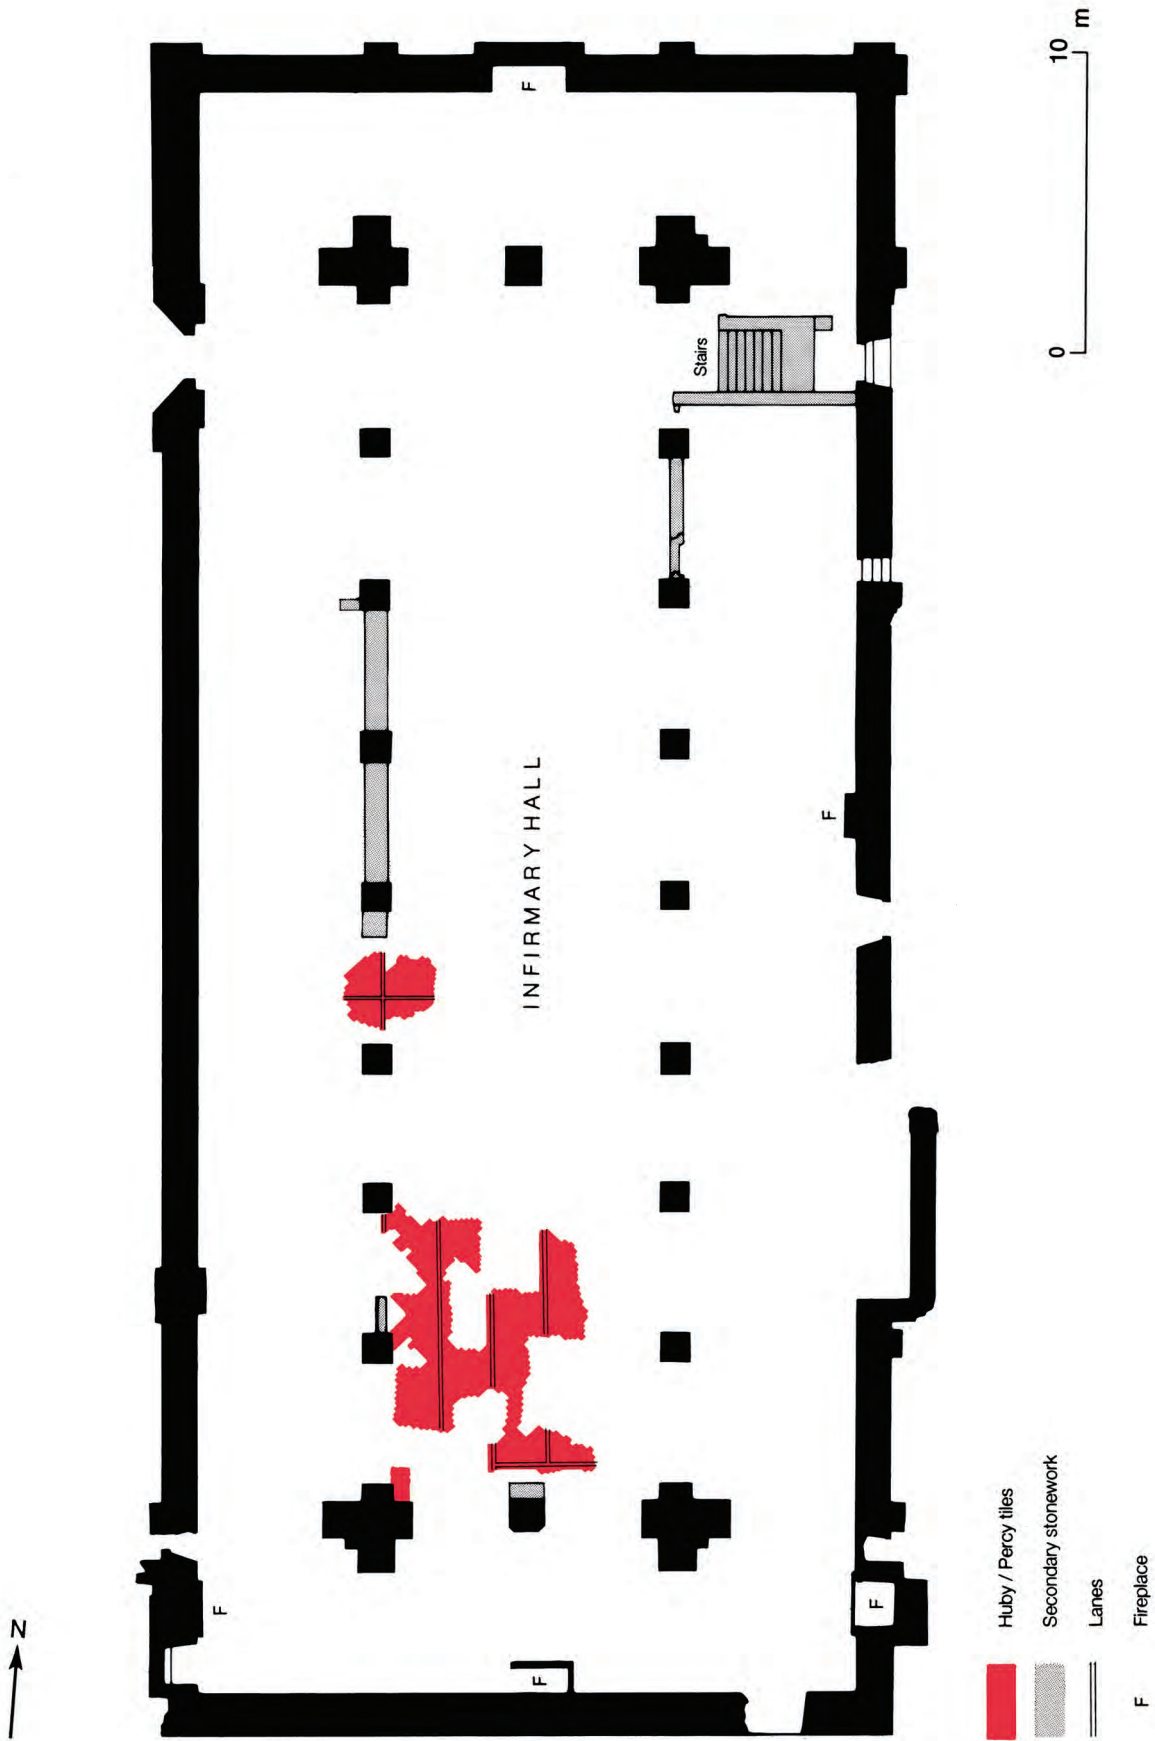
11: Fountains infirmary, showing the layout of the Hubby/Percy pavement of c. 1500. This building was constructed as an aisled hall and subsequently divided up to form a series of rooms with fireplaces and other fittings. Scale 1:250
